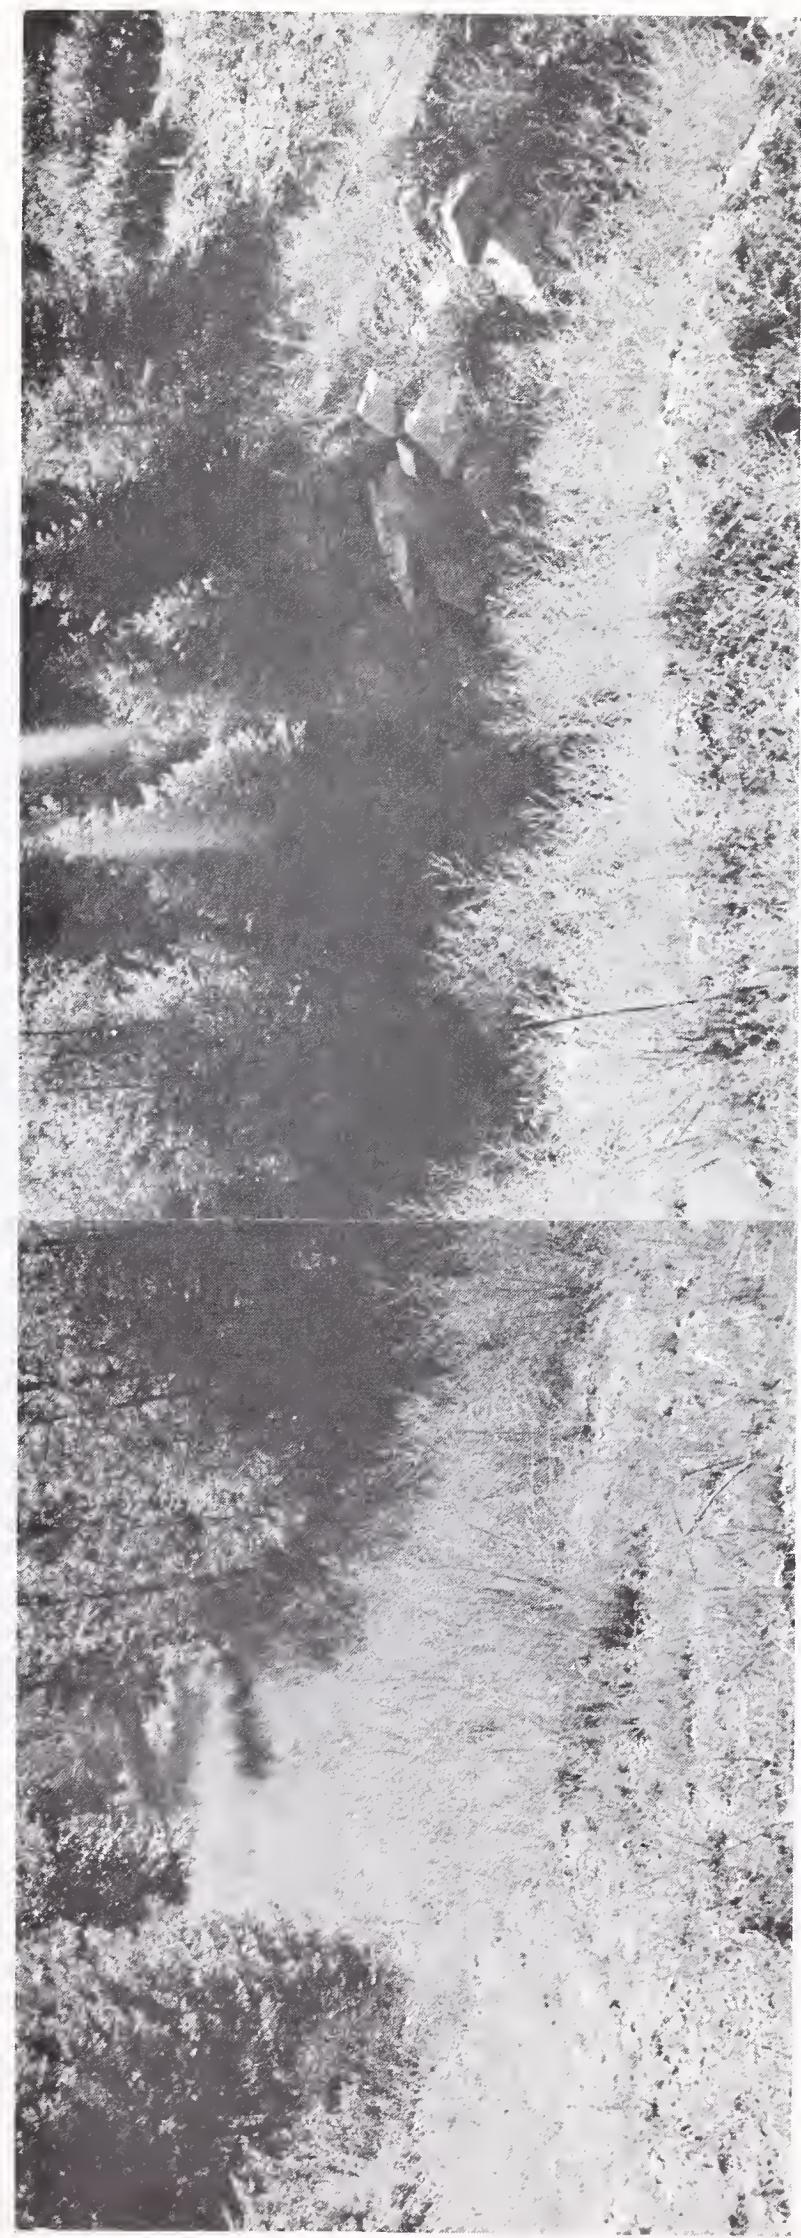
Spillway Channel Looking Upstream Toward Reservoir From the Control Section.
